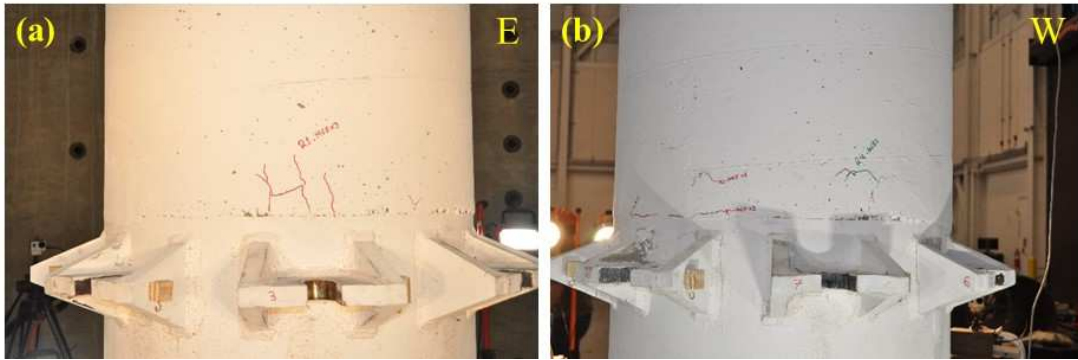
PU column at 1.8×DE (1.2×MCE) at the loading rate of 0.11 in/sec: crack in cover concrete.
